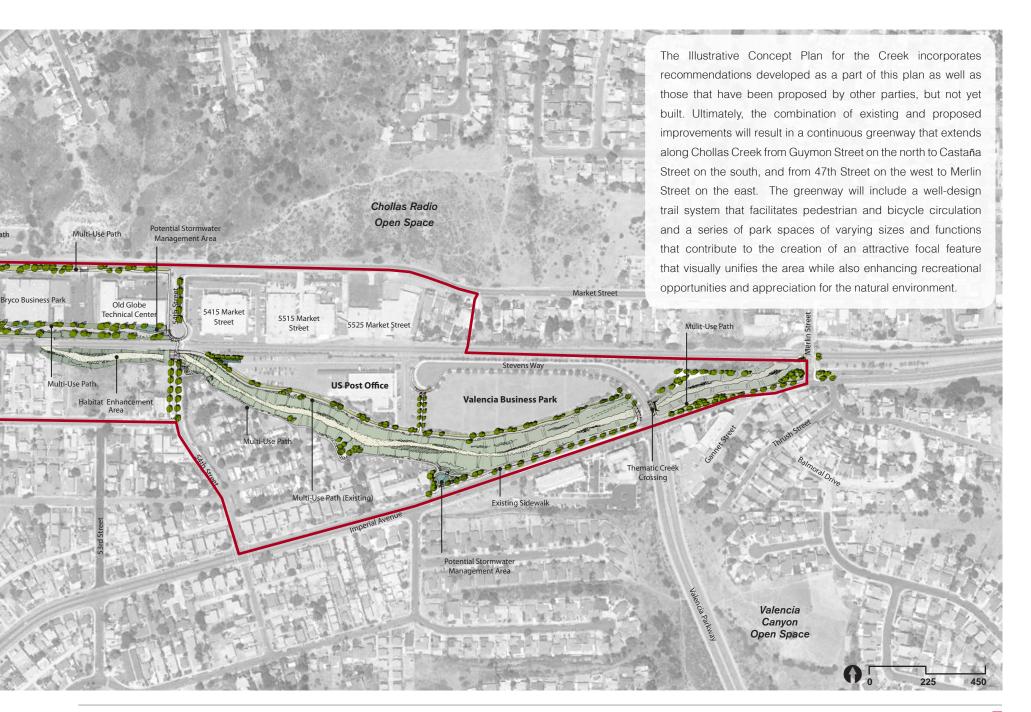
Proposed Overall Chollas Creek Illustrative Plan
